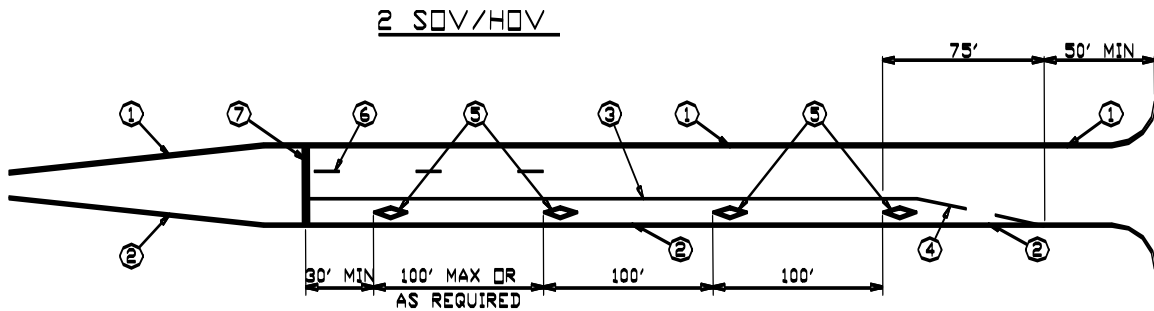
1-Lane Pavement Marking Requirements
